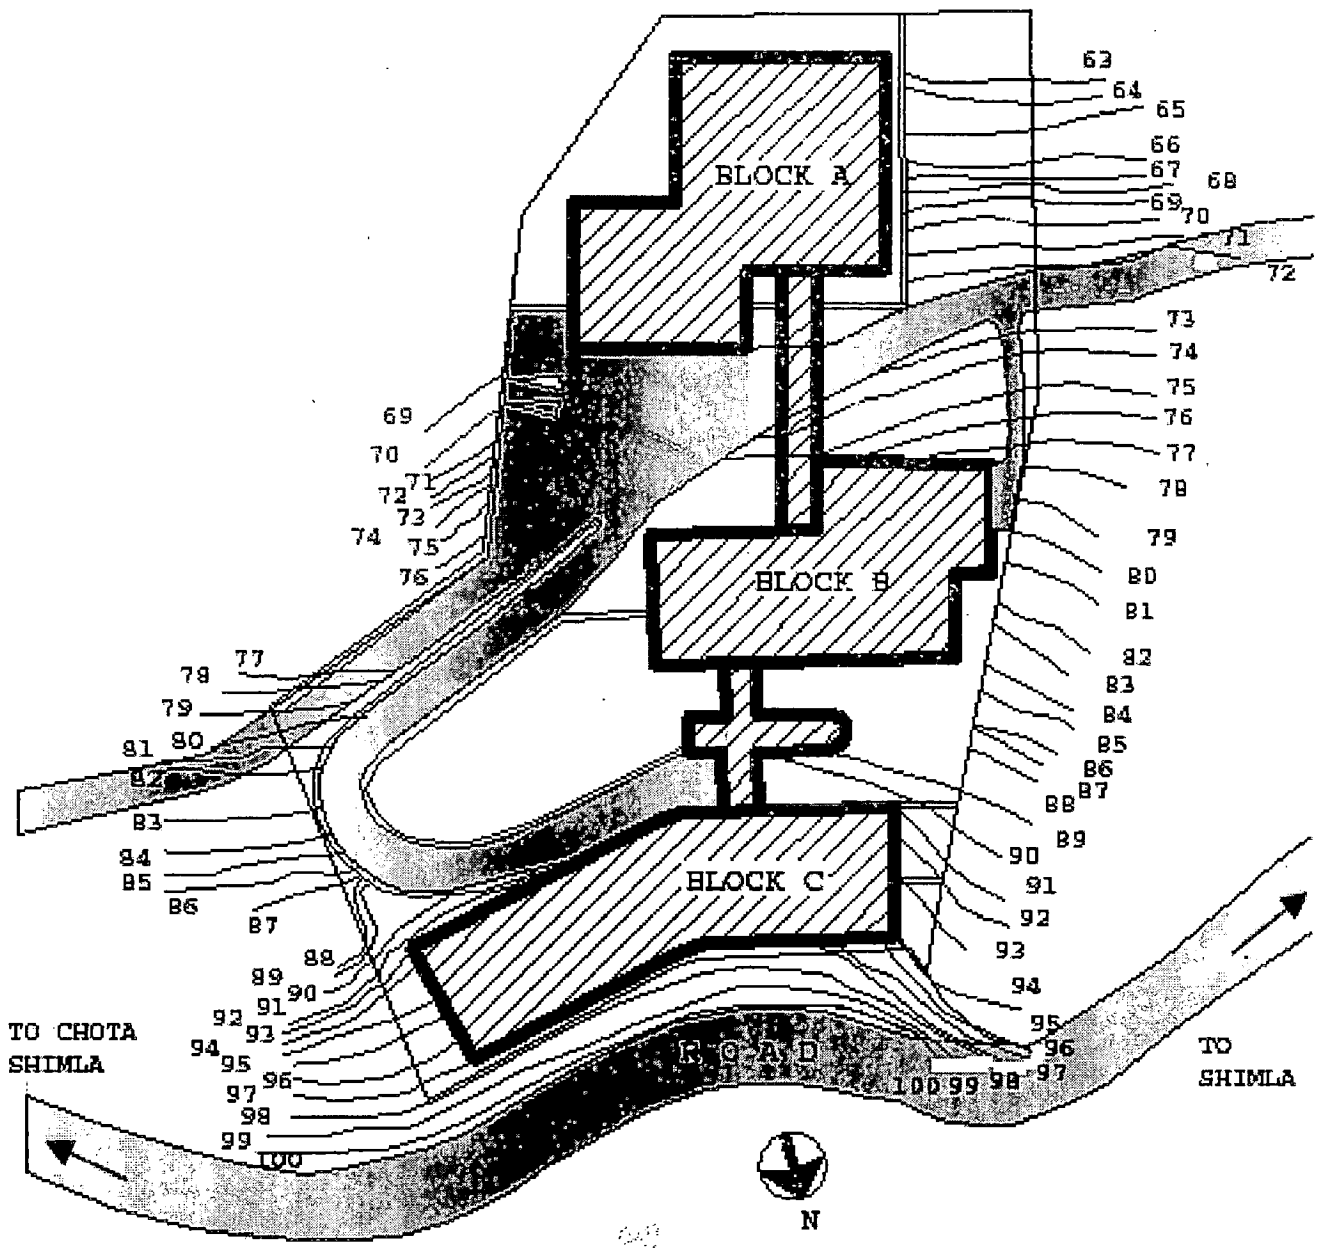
Site plan of the police headquarter complex, Shimla
